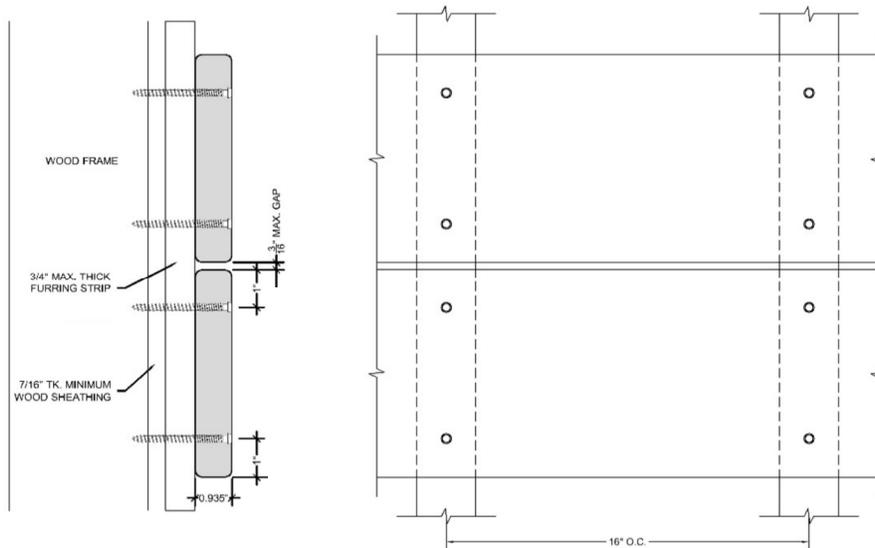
HORIZONTAL INSTALLATION OF FIBERON CLADDING BOARDS
